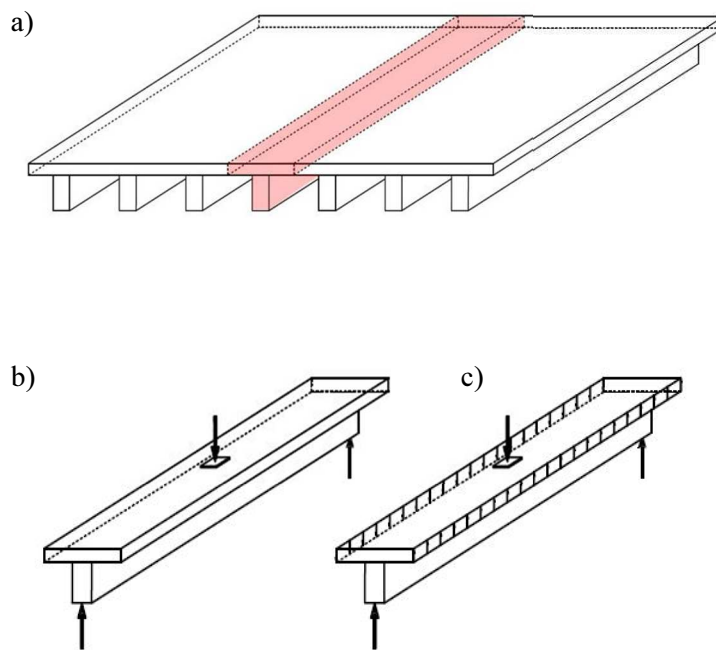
(a) TCC floor with a single slab spanning multiple timber joists, (b) isolated T-section, (c) isolated T-section with corresponding shear forces along the interfaces
